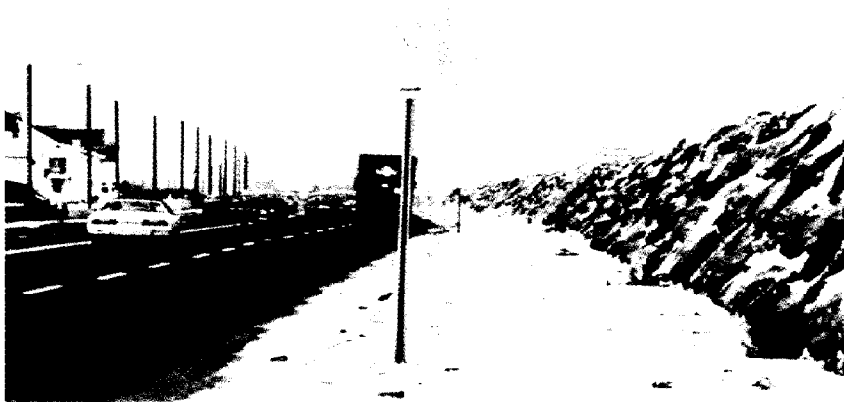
Monmouth Beach, New Jersey, seawall. Photo by Orrin Pilkey, Jr.
